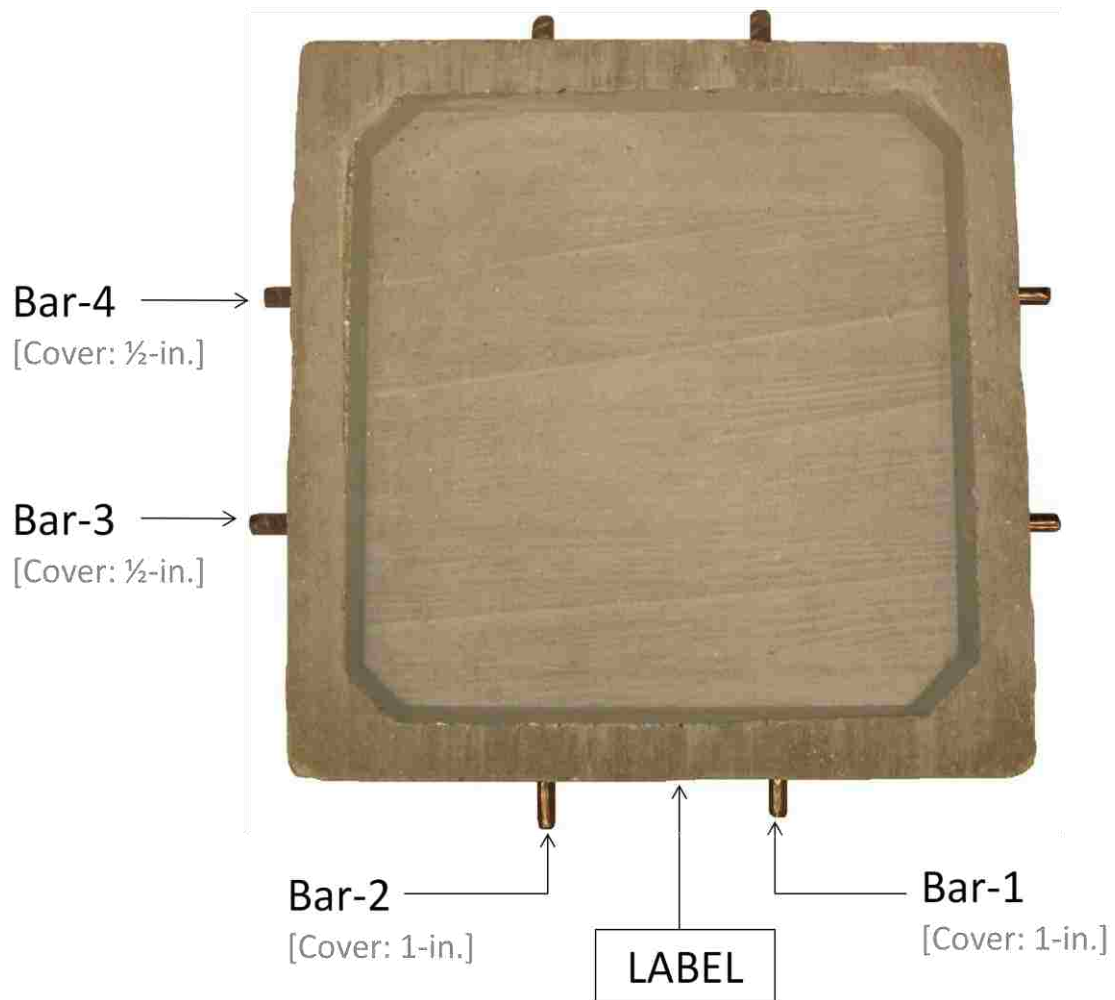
Labeling of bars embedded within a ponding specimen with respect to the specimen's label.
